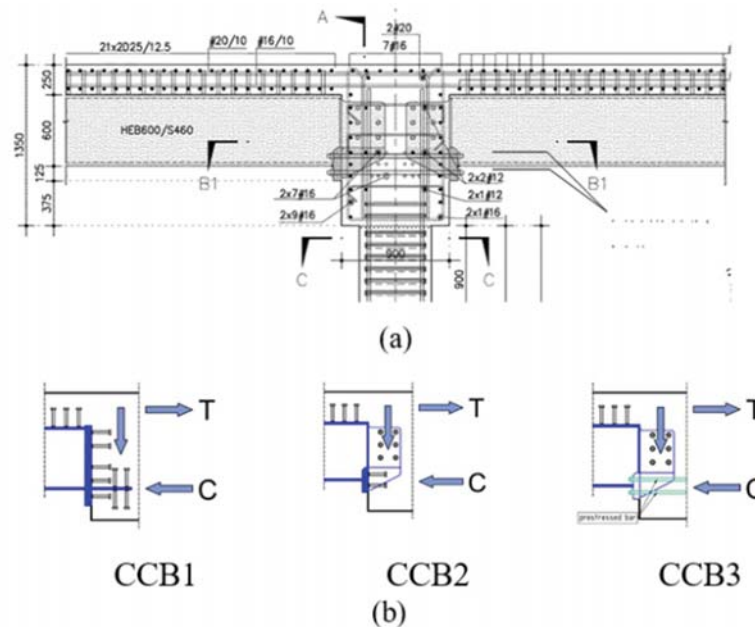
(a) Pier-Deck joint with Concrete Cross Beam, (b) Static behavior of Pier-to-deck Joints
